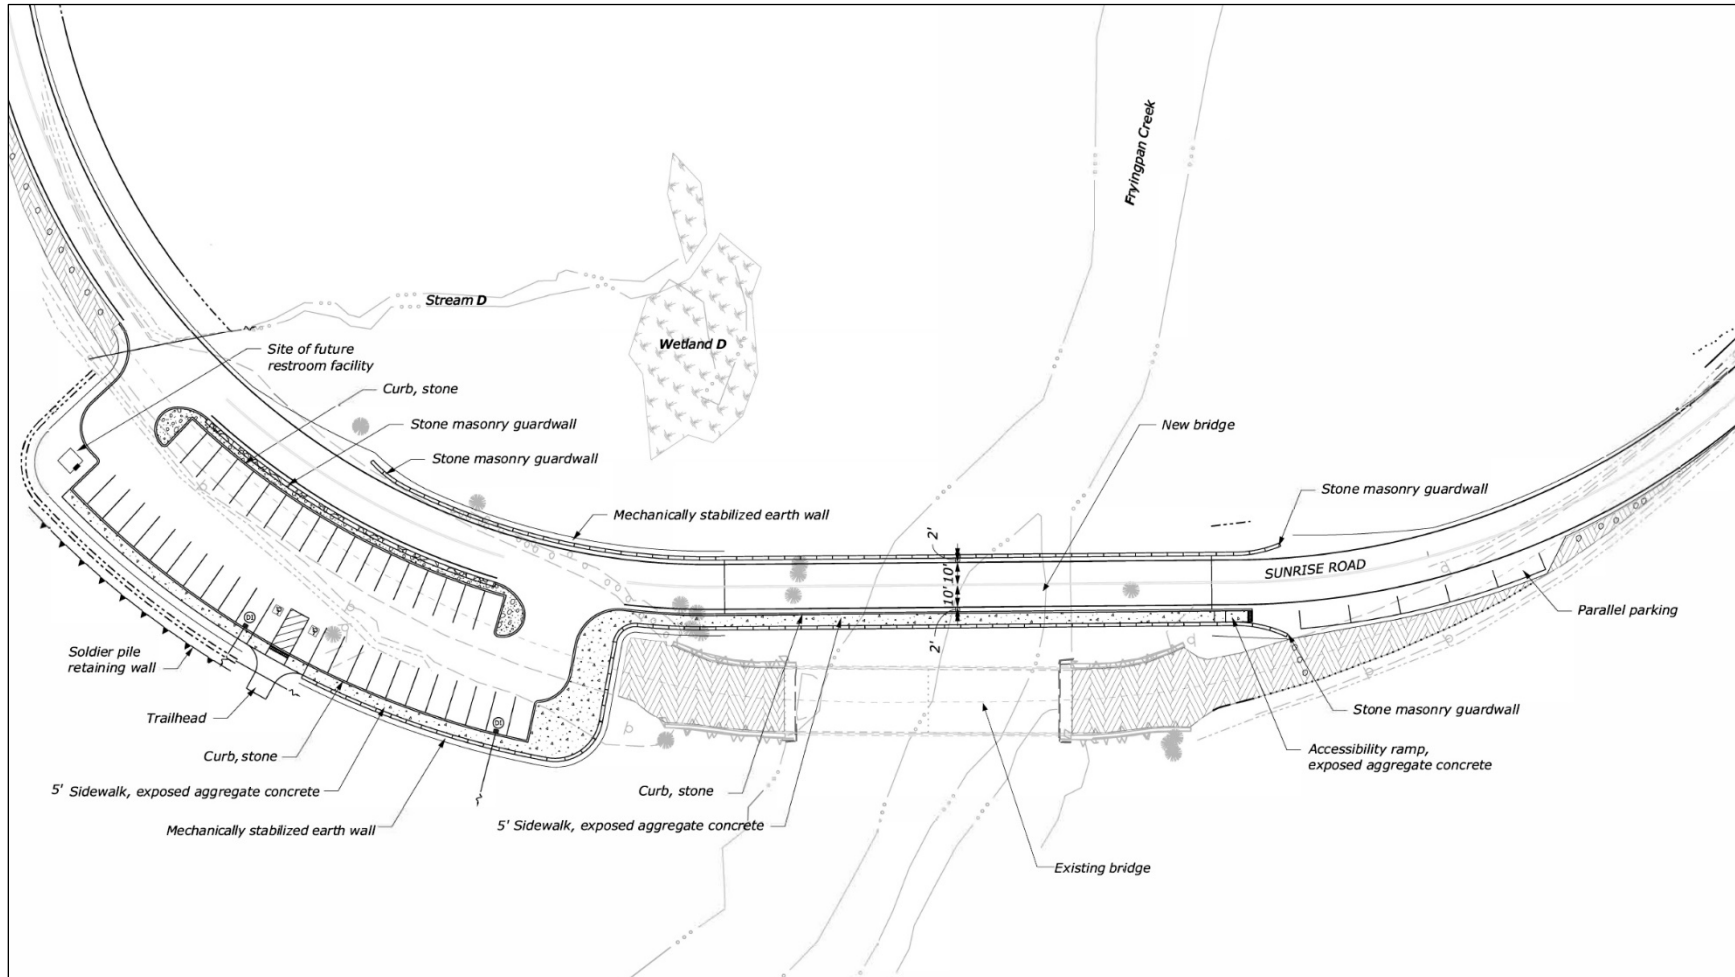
Rendering of New Bridge under Alternative B/Proposed Action/Preferred Alternative – New Bridge on a New Alignment Downstream of Existing Bridge
